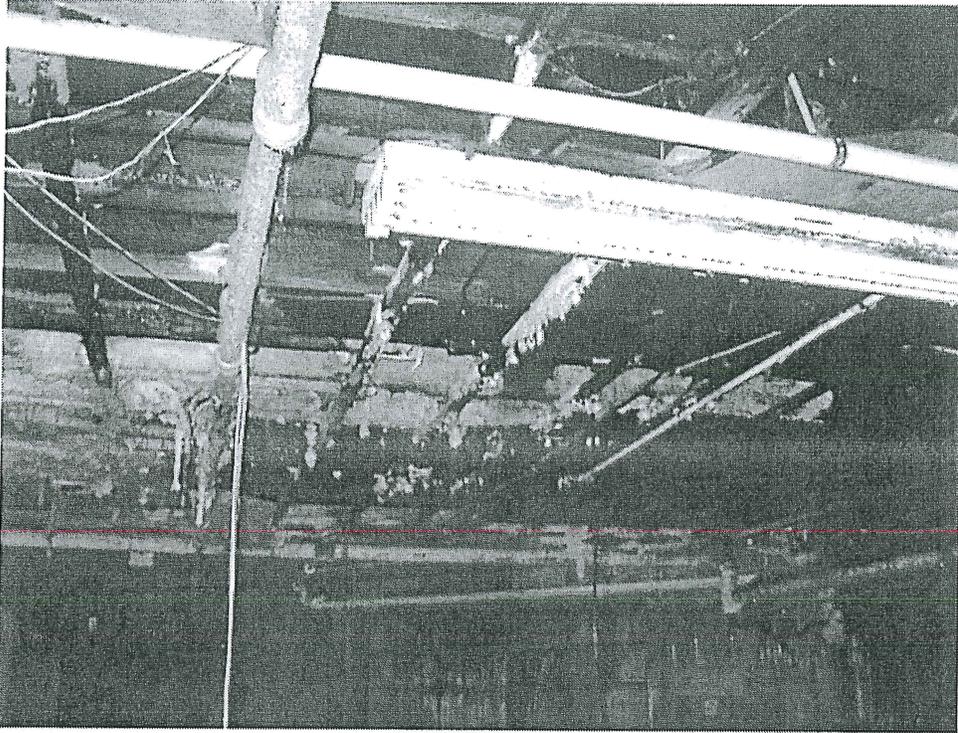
General view of white colored fruit bodies at the first floor framing
